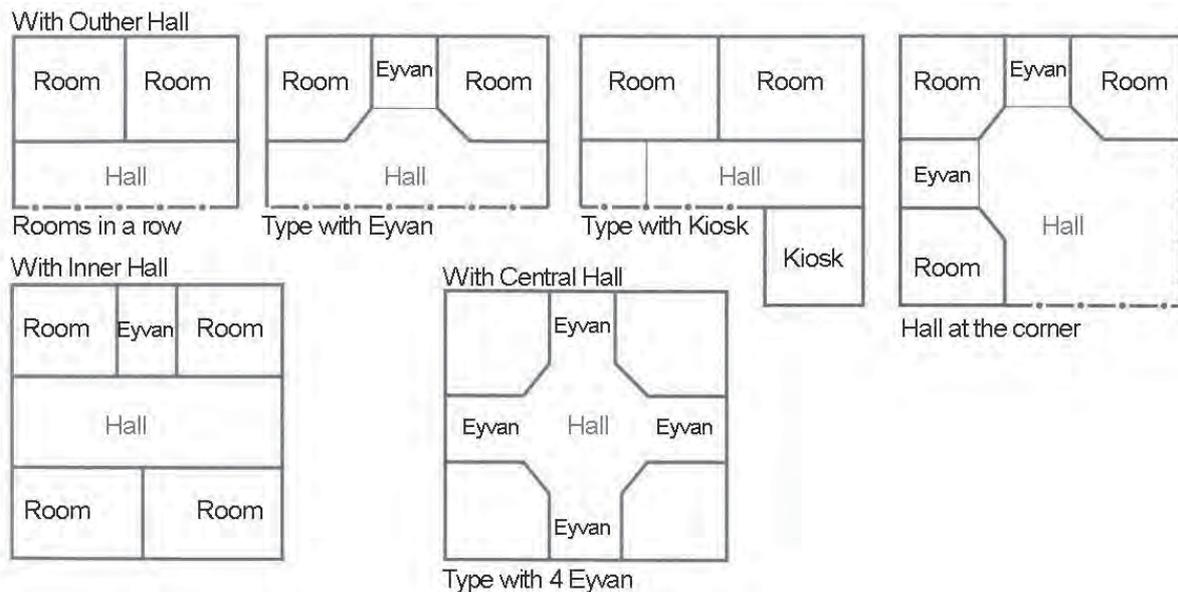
Plan types and plan components of Traditional Turkish Houses [8]
